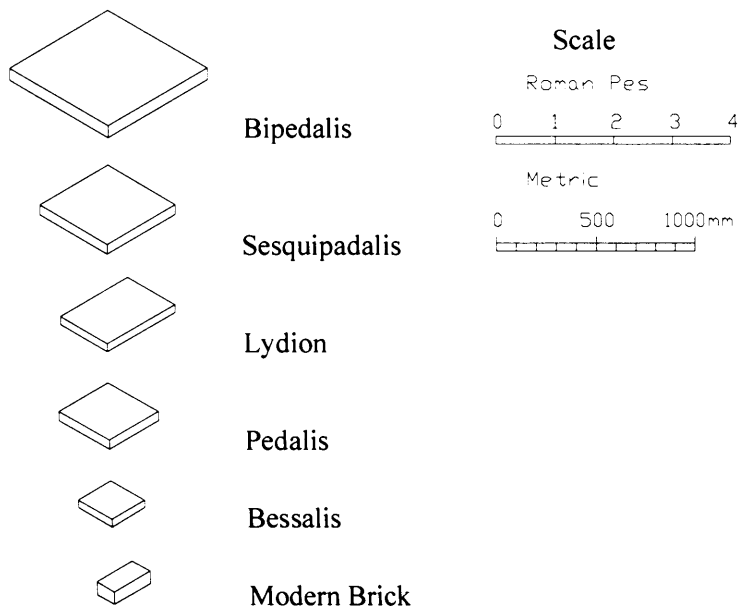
Scaled isometric drawings of the bricks types in Roman Buildings
